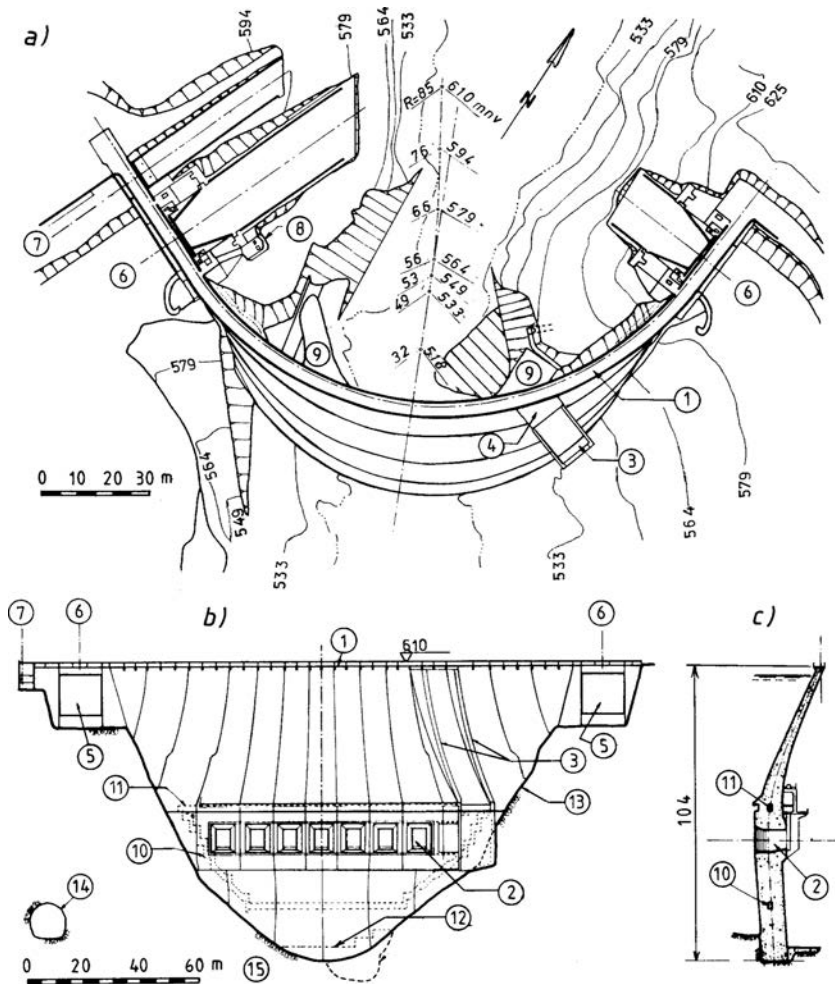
Boundary dam (USA). (a) Plan; (b) view of the downstream face; (c) cross-section. (1) Roadway over the crest; (2) outlet openings,  $b \times h = 5.2 \times 6.4$  m; (3) overhaul gate with movable frame; (4) platform for elevator, at elevation 610; (5) spillway; (6) axis of the segment gate,  $15.2 \times 13.4$  m; (7) axis of the gate for discharge of ice, etc., at maintaining the reservoir storage,  $7.9 \times 2.4$  m; (8) access lift; (9) access bridge; (10) foundation gallery; (11) handling gallery; (12) contour of concrete plug; (13) line of excavation; (14) diversion tunnel; (15) bedrock – gray and dolomite limestone.
